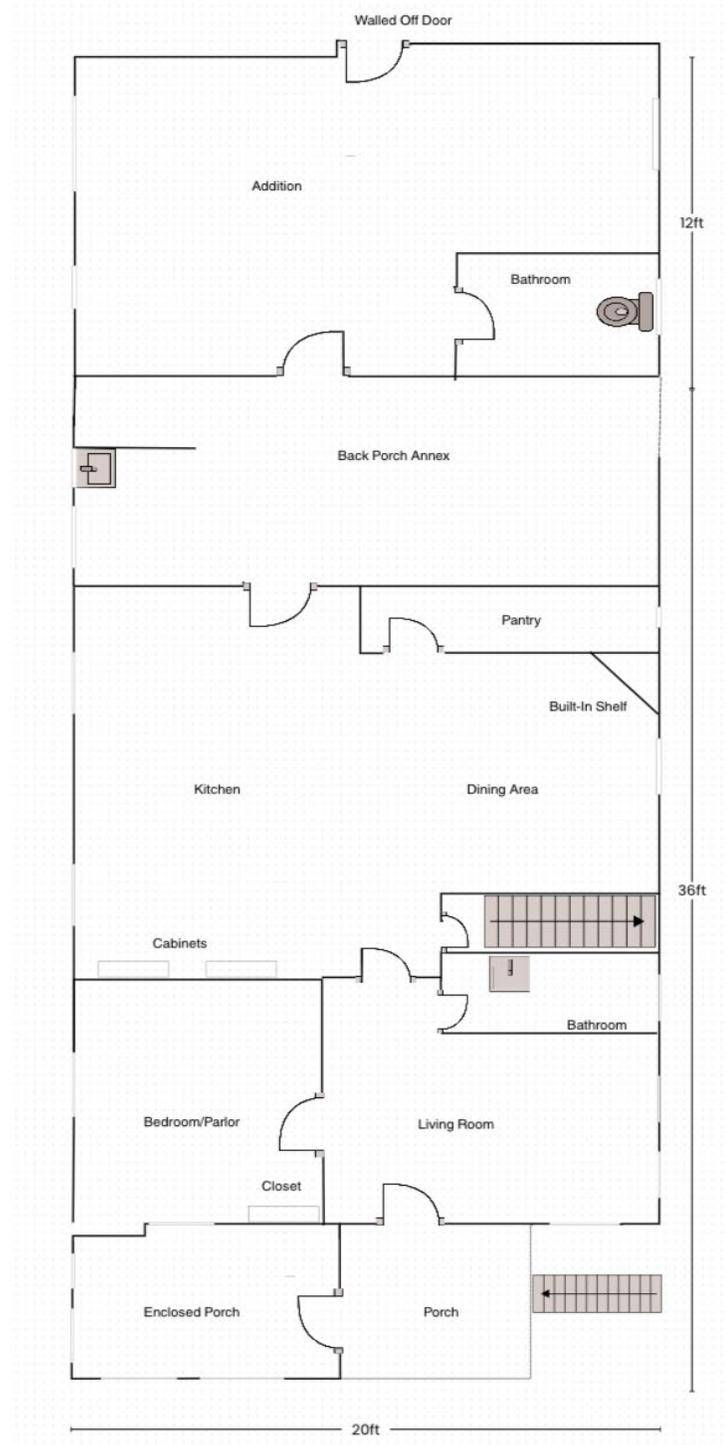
Two-Story Farmhouse Floor Plan, First Floor (Schiffman).⁵²
